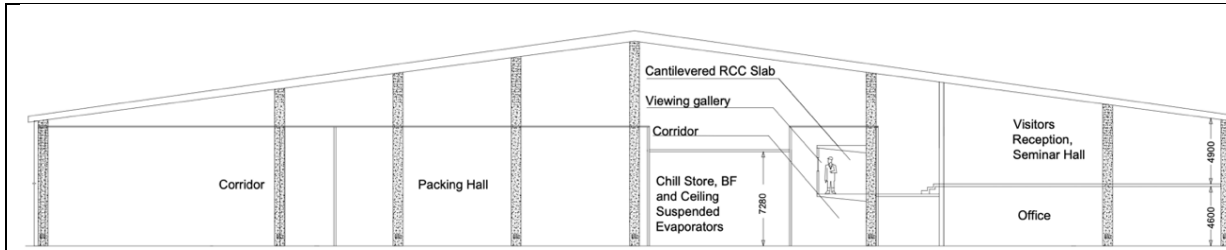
Cross section at BB-BB through the building plan shown in figure 30.
